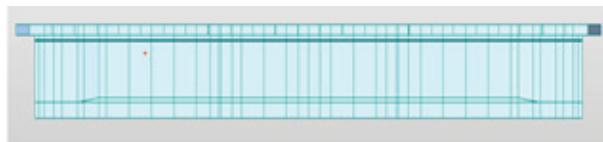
Post-tensioned I girder in MIDAS CIVIL- Longitudinal View
